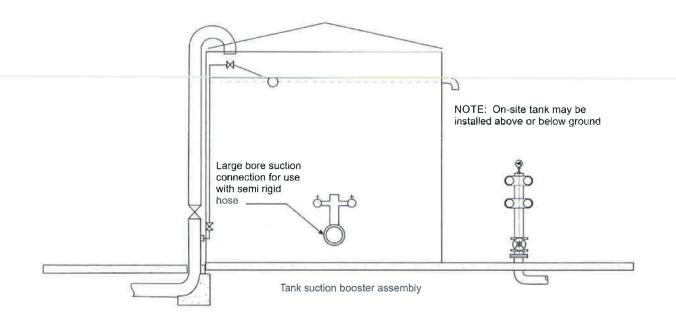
Tank suction booster assembly provides for the use of semi-rigid large bore hose
